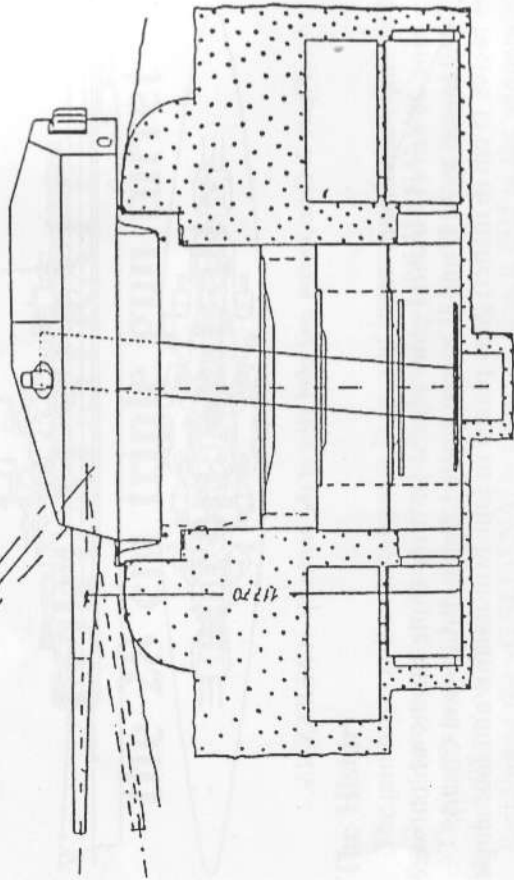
Cross section of the construction which shows the comprehensive concrete work.
